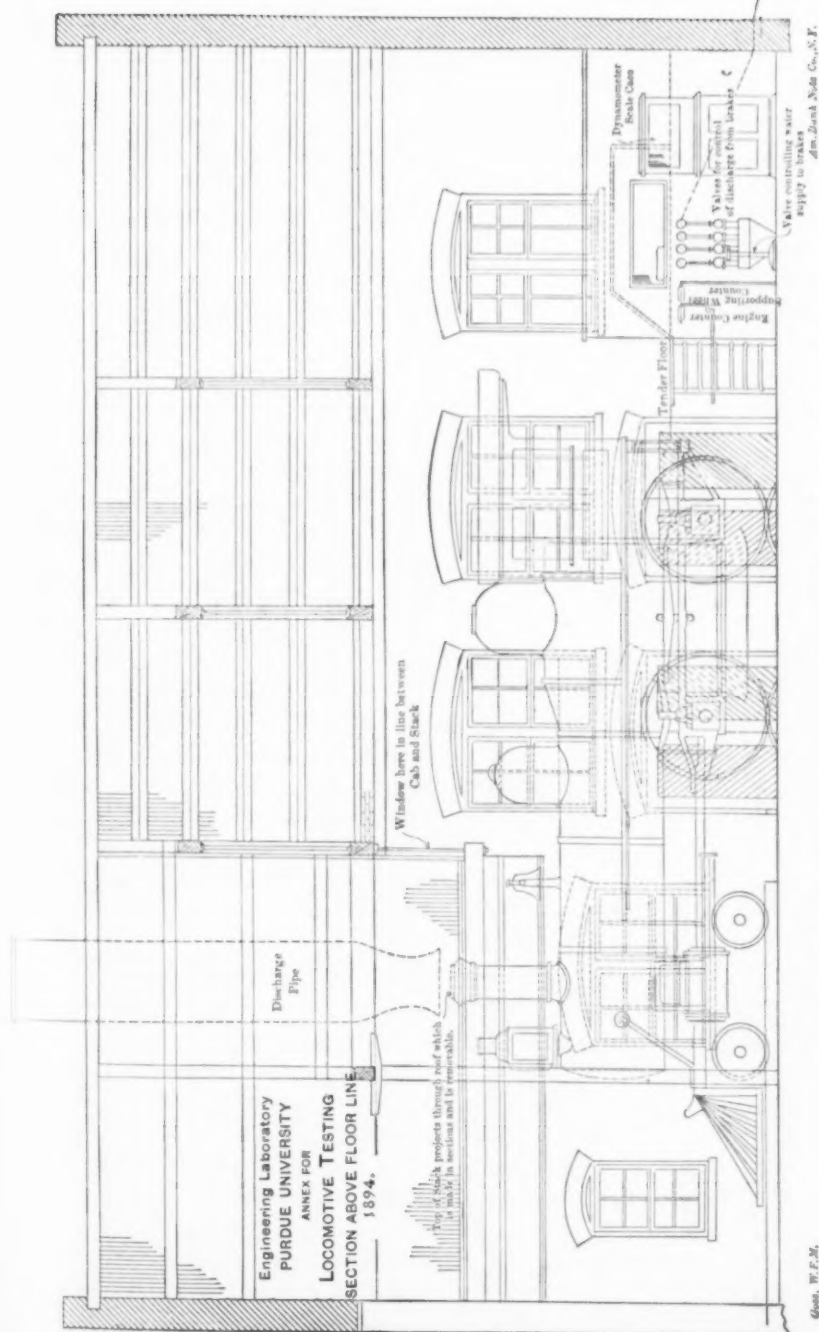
ELEVATION SHOWING ACCESSORY APPARATUS, SECOND PURDUE PLANT.
